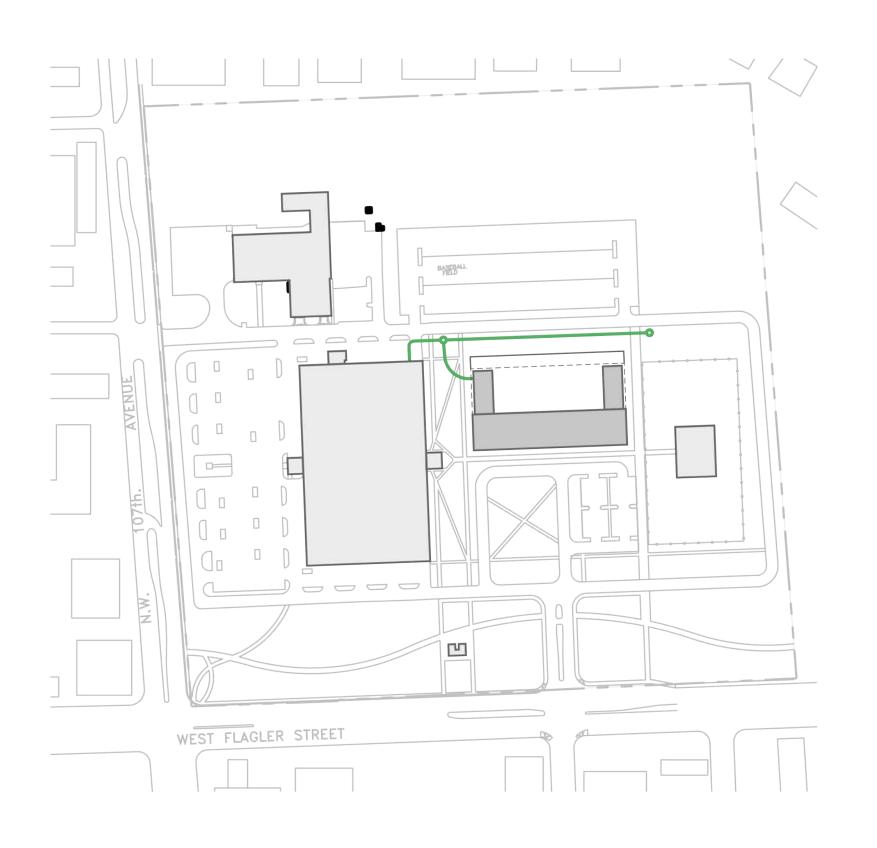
ENGINEERING CAMPUS 2015 ELECTRICAL INFRASTRUCTURE PLAN
